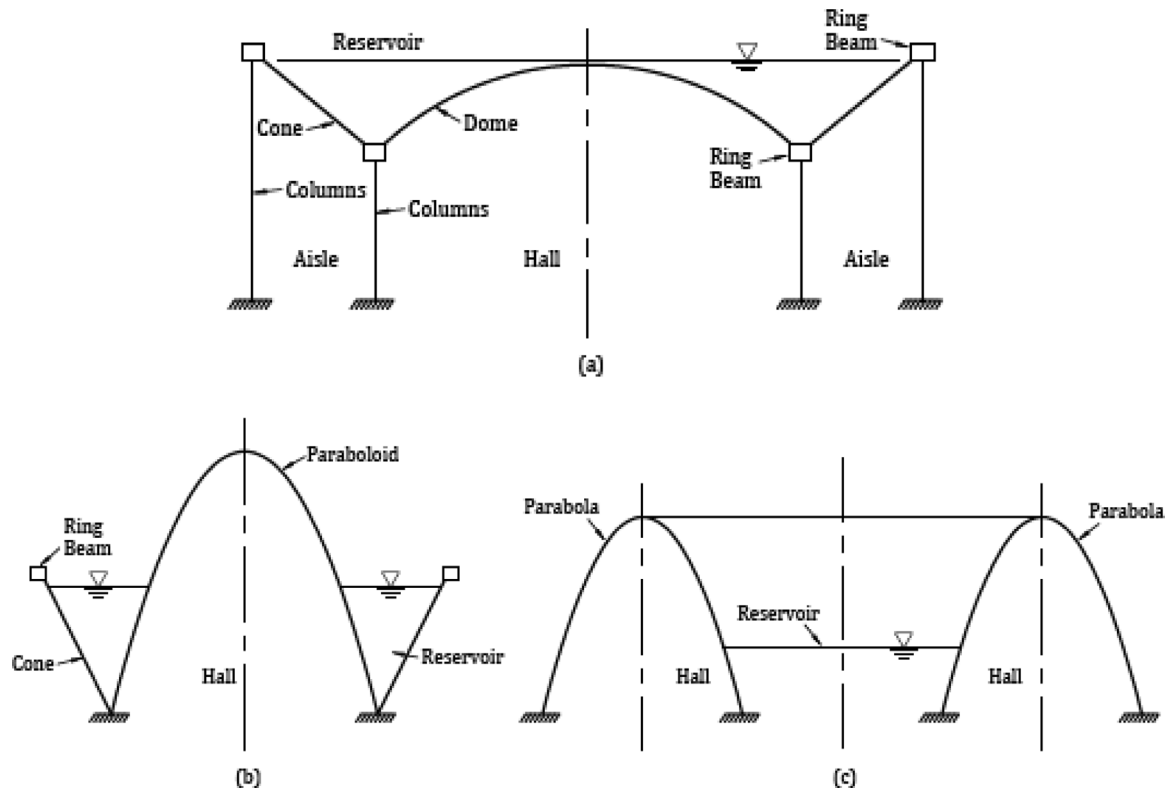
Some dual-purpose concrete shells: (a) conical-spherical shell assembly serving as the roof of a large circular hall and the sloping walls and concave floor of an elevated water reservoir; (b) tall paraboloidal exhibition hall surrounded by a conical reservoir; (c) toroidal hall of parabolic cross-section with a central water reservoir.
